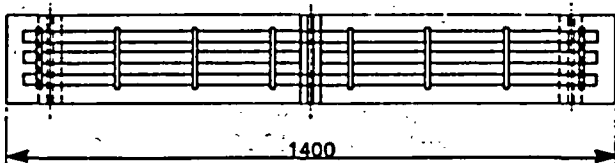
Schematics of tension and shear crack-type reinforced concrete beam test specimens. Source: P. C. Hewlett and J. G. D. Morgan, "Static and Cyclic Response Reinforced Concrete Beams Repaired by Resin Injection," *Mag. Concr. Res.* 34(118) (May 1982).
